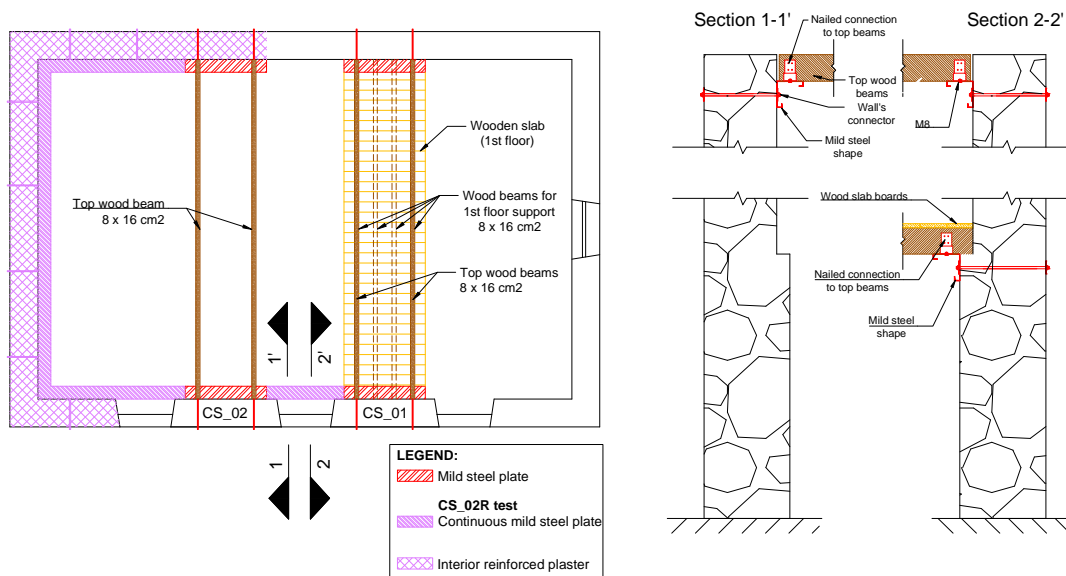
Strengthening applied on CS\_01R test: a) general view; b) detail of the connection at 1<sup>st</sup> floor level
